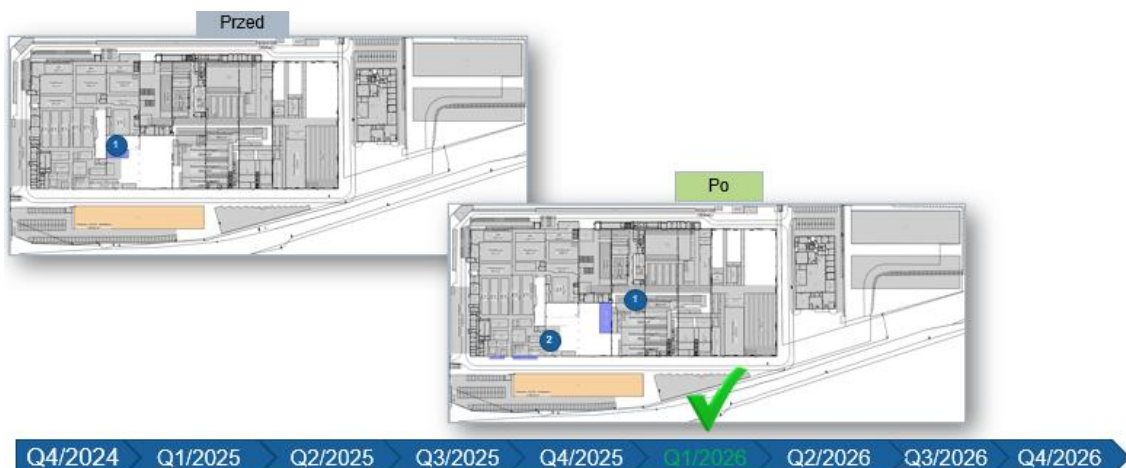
Reconstruction Plan - Stage VII: 1-Transfer of threading machines; 2-Installation of extraction and ventilation in the new area for the welding shop.
